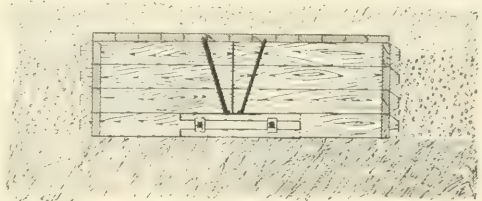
FACE OF DRIVE SHOWING METHOD OF HOLDING FACE LATHS IN POSITION WITH SPEAR DOGS.
